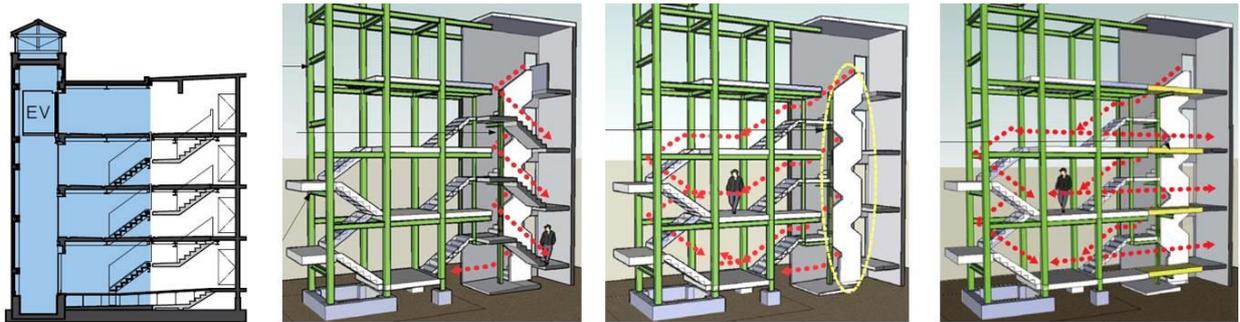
Elevator addition system. Installation works can be done without interrupting residents' activities (Source: UR)
